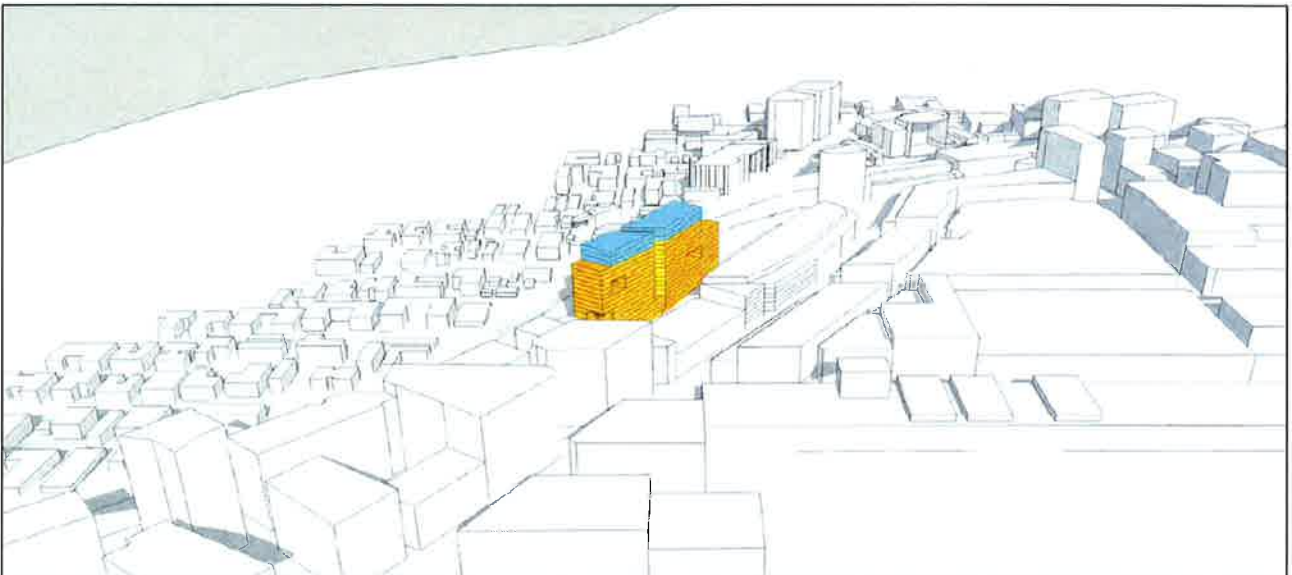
Perspective drawing of the proposal looking south-west (source: Proponent's EA)
